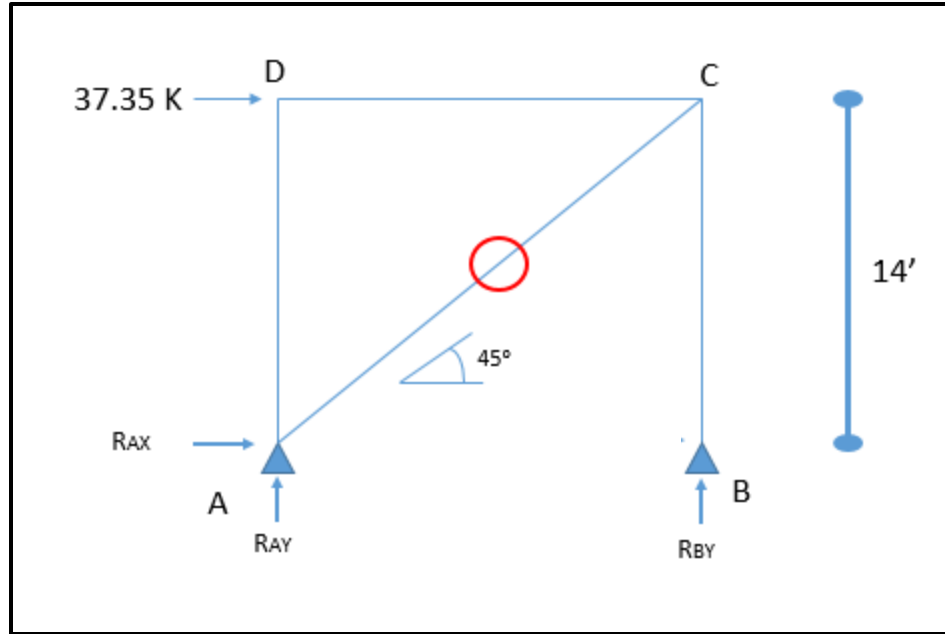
Bottom Frame in the Elevation View Depicting the Frame that will be Sized
